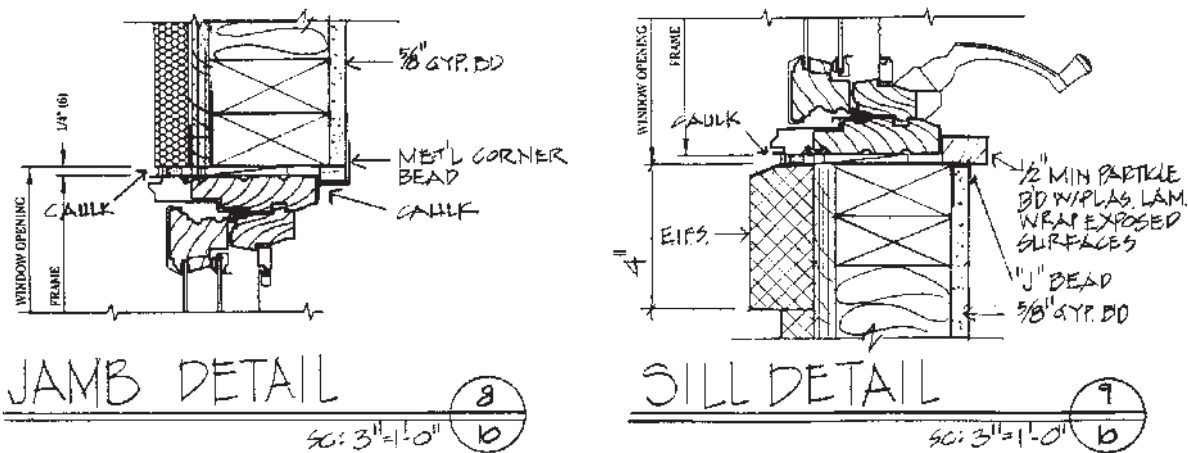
Drawings used to communicate how something should be constructed are scaled, detailed, and more accurate; they also show materials to be used.
